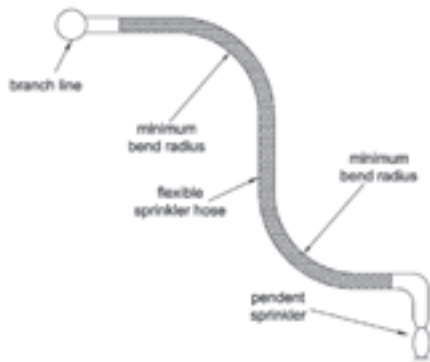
Two 90-degree bends in a flexible sprinkler hose installation.
